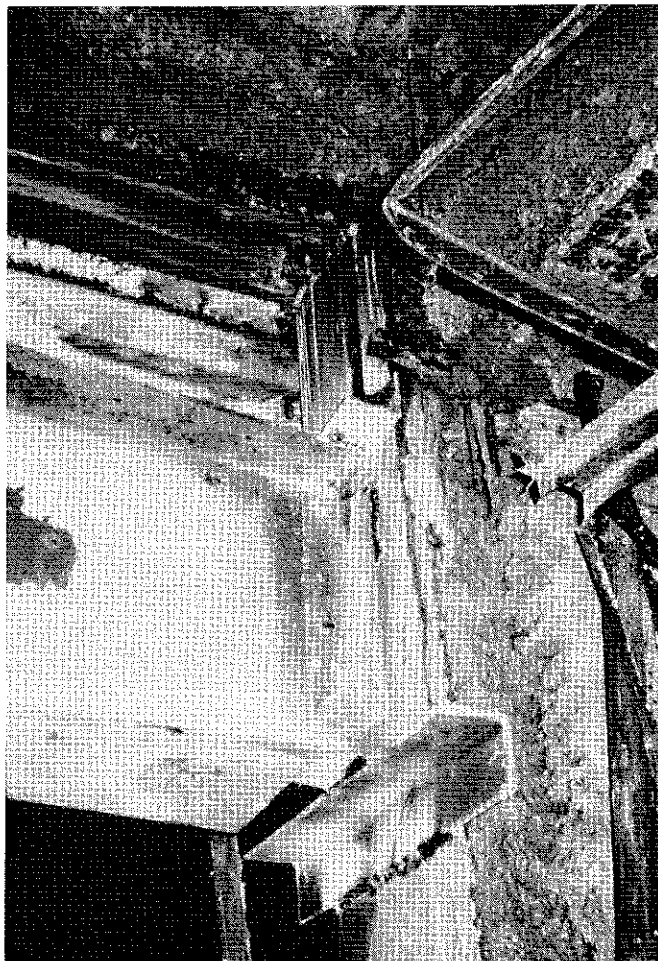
(Left) Partial collapse of another girder again showing failure of the welded connection.
